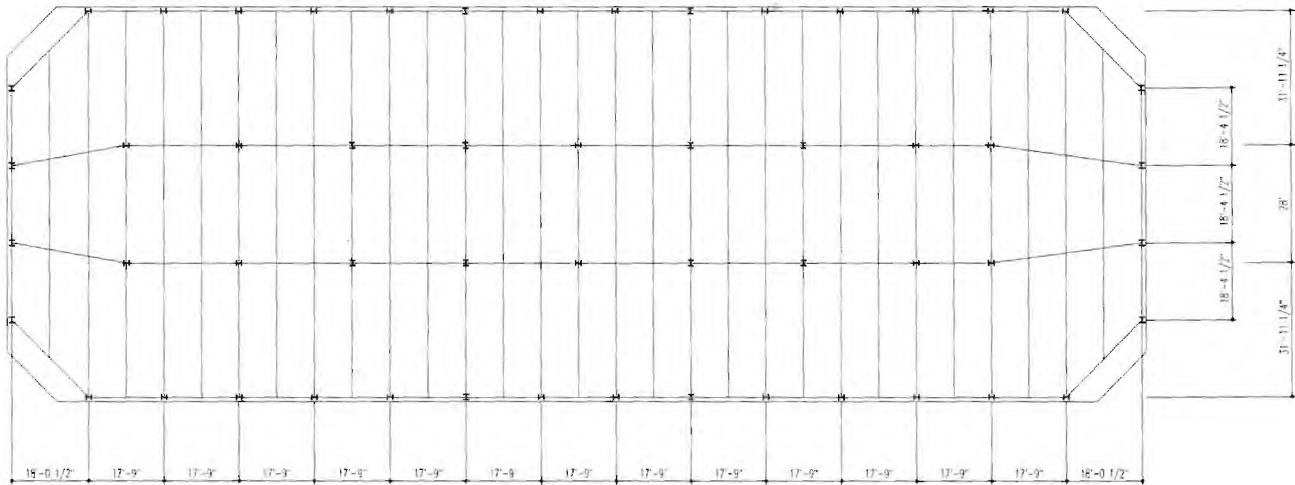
Baseline Building Floor Plan (1 ft = 30.5 cm)
